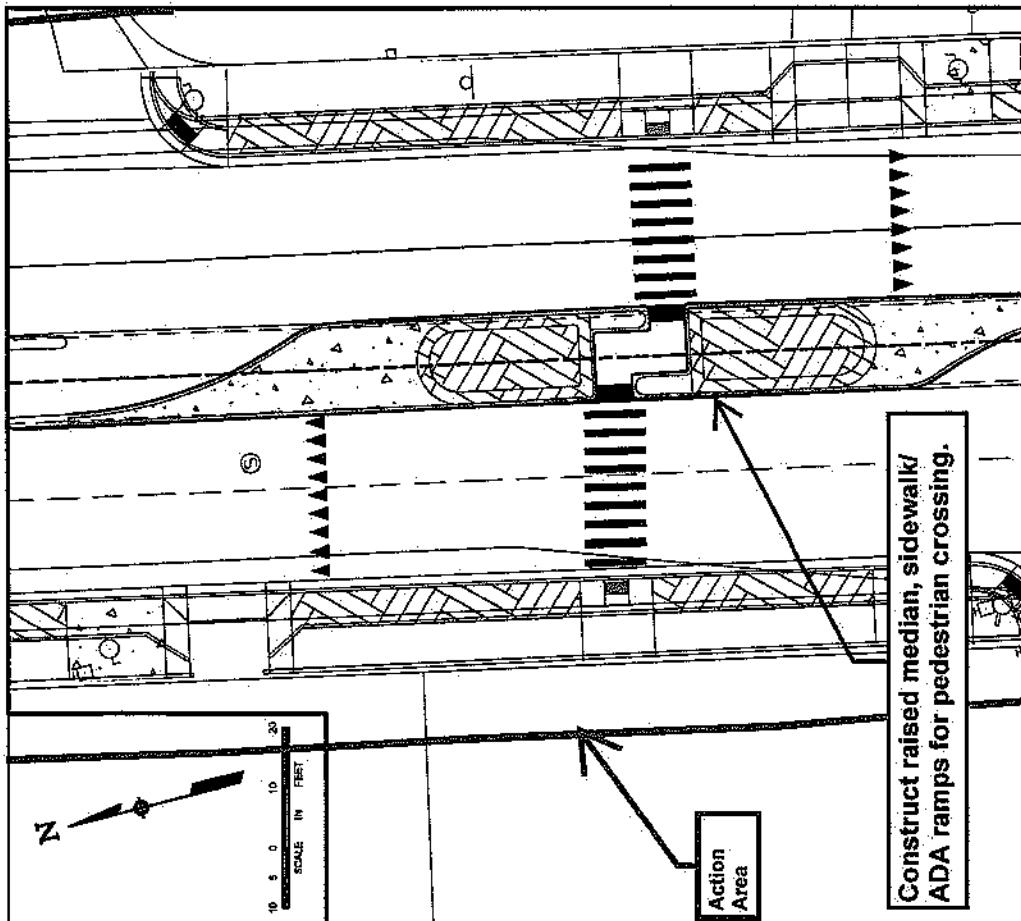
PEREZ LOOP AND SAN ANTONIO STREET PEDESTRIAN CROSSING PLANS
